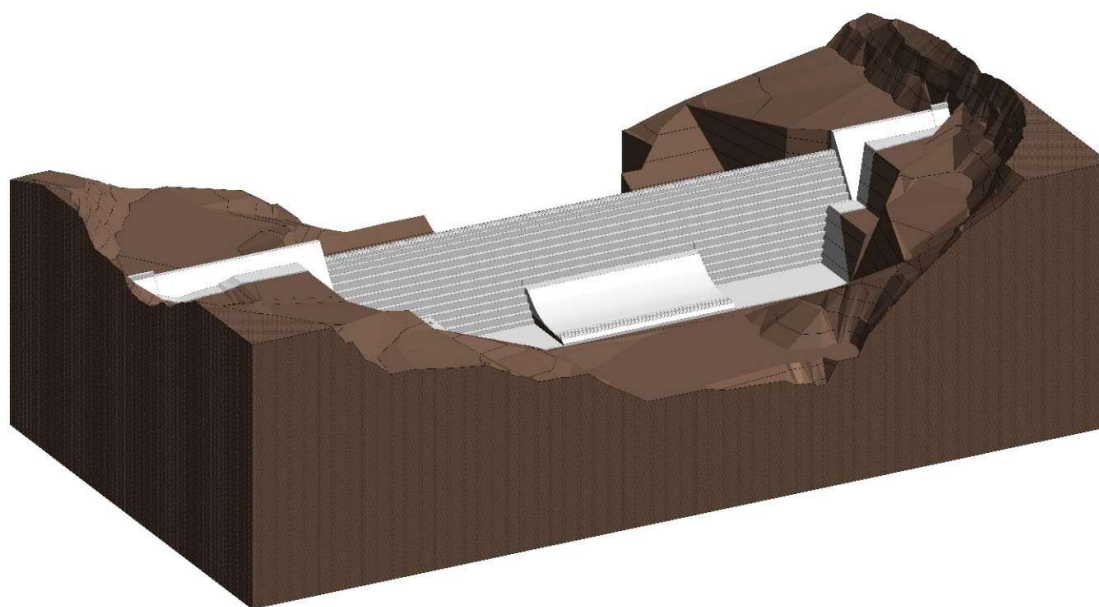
Concept Design of the Oaky River Dam Wall Reconstruction
